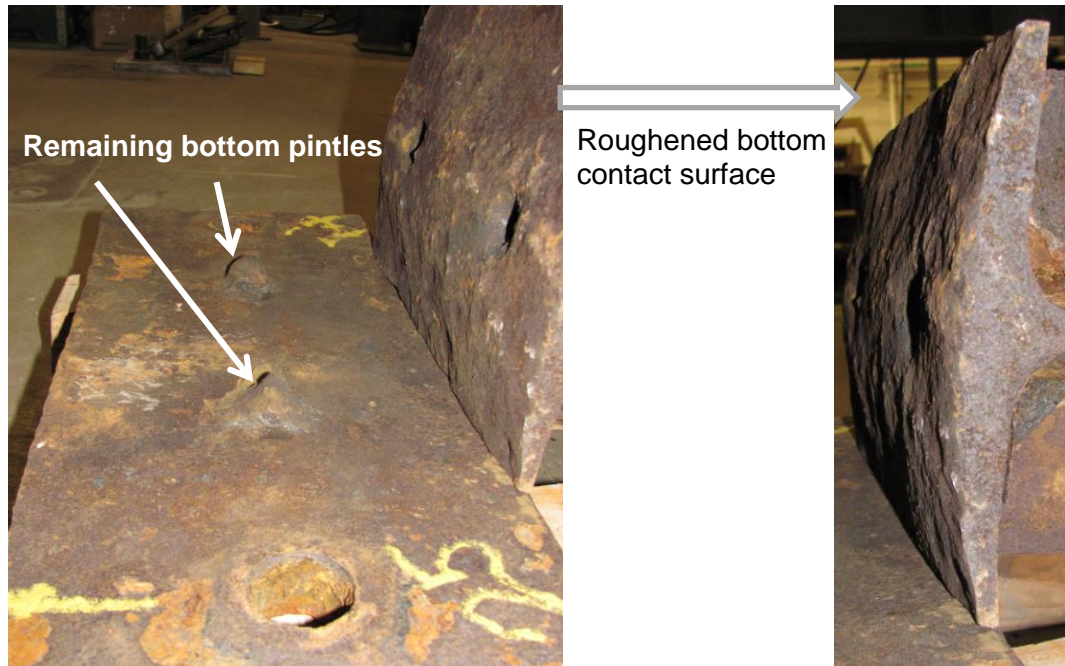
Cleaned bottom contact interface of bearing AR25
